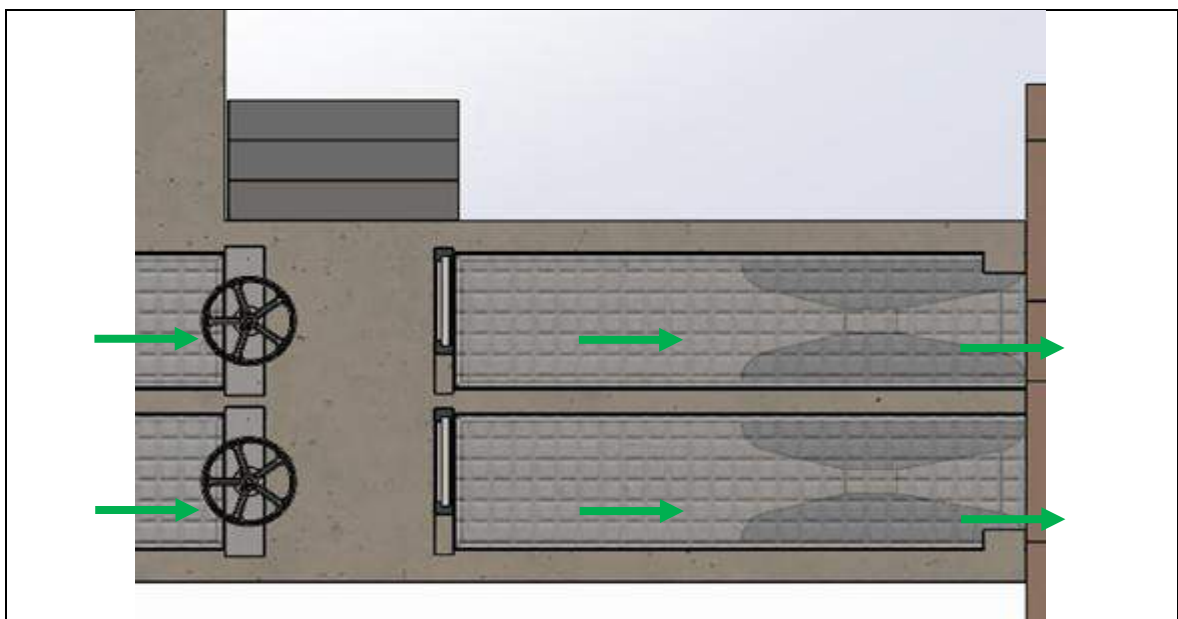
Plan View of Parshall Flume Installation at Ultimate Capacity
